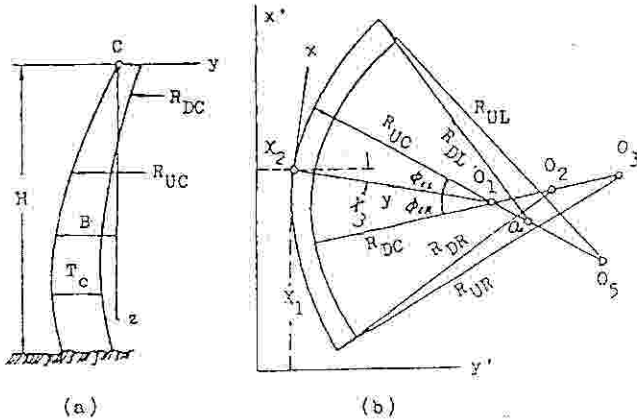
Five centered Double Curvature Arch Dam a) Central Vertical Section b) Horizontal Section
